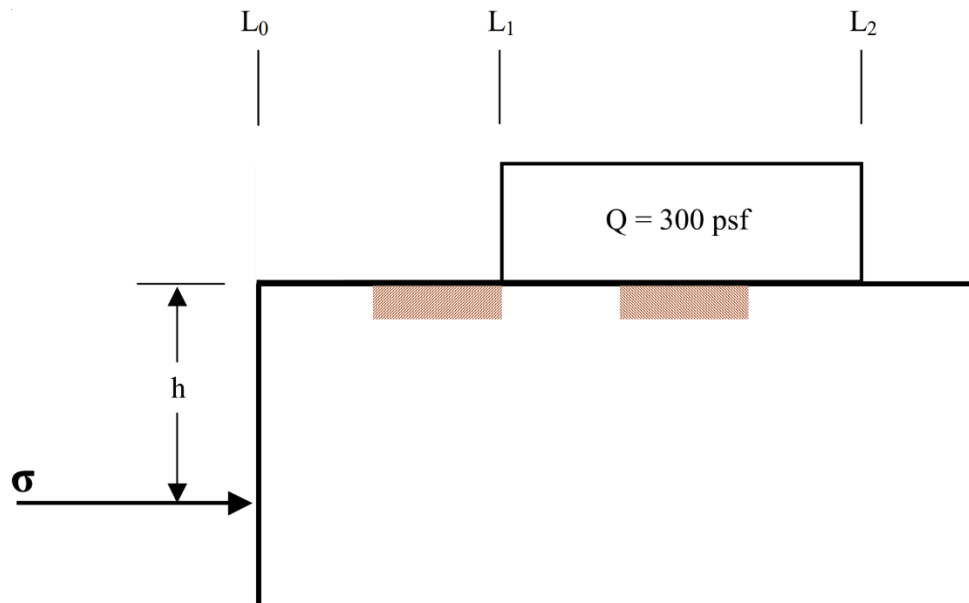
Typical 300 psf Vertical Surcharge Starting Away from Face of Excavation
